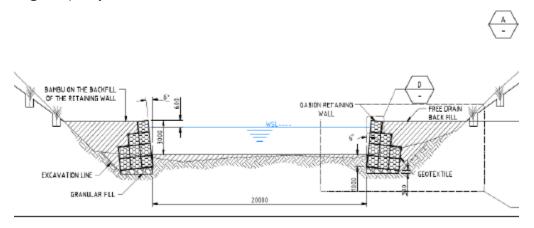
Typical Proposed Gabion retaining wall for stream bank protection-SMEC, 2016
